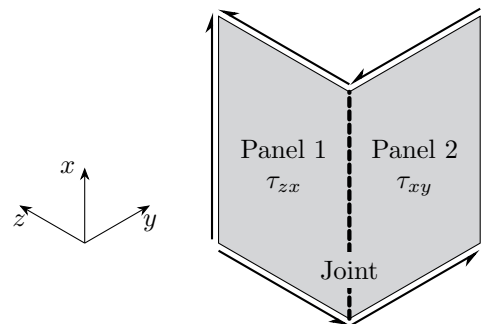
Corner joint connecting two reinforced concrete panels subject to pure shear analysed using a single joint element.
